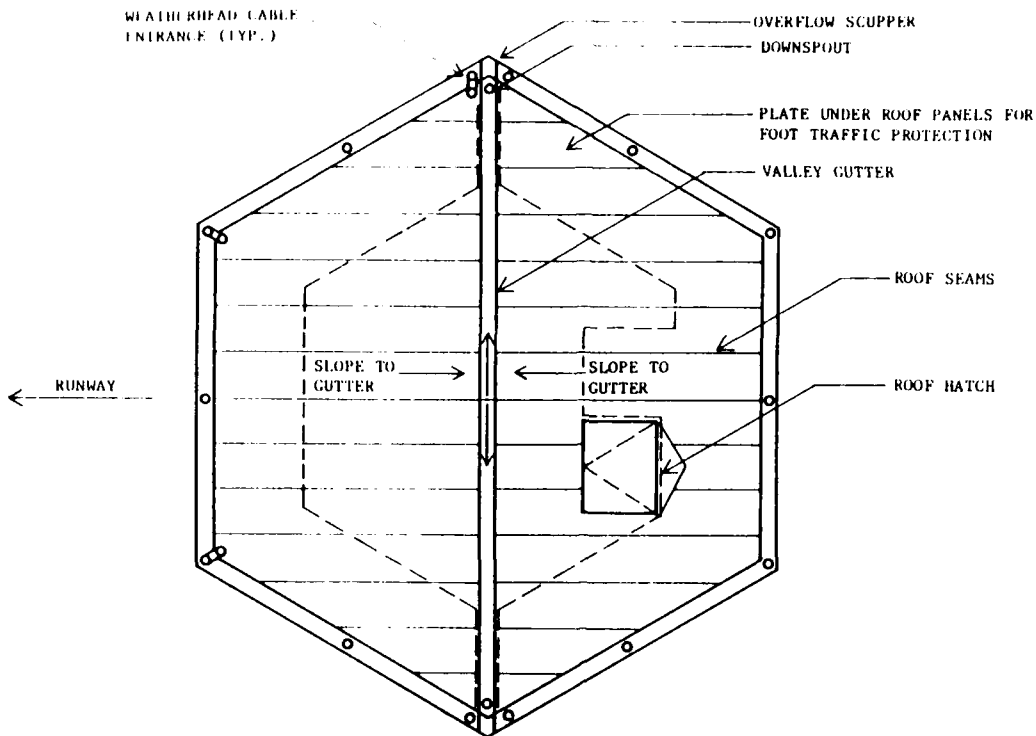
Roof drainage detail (standing seam metal roof with exterior drainage).
